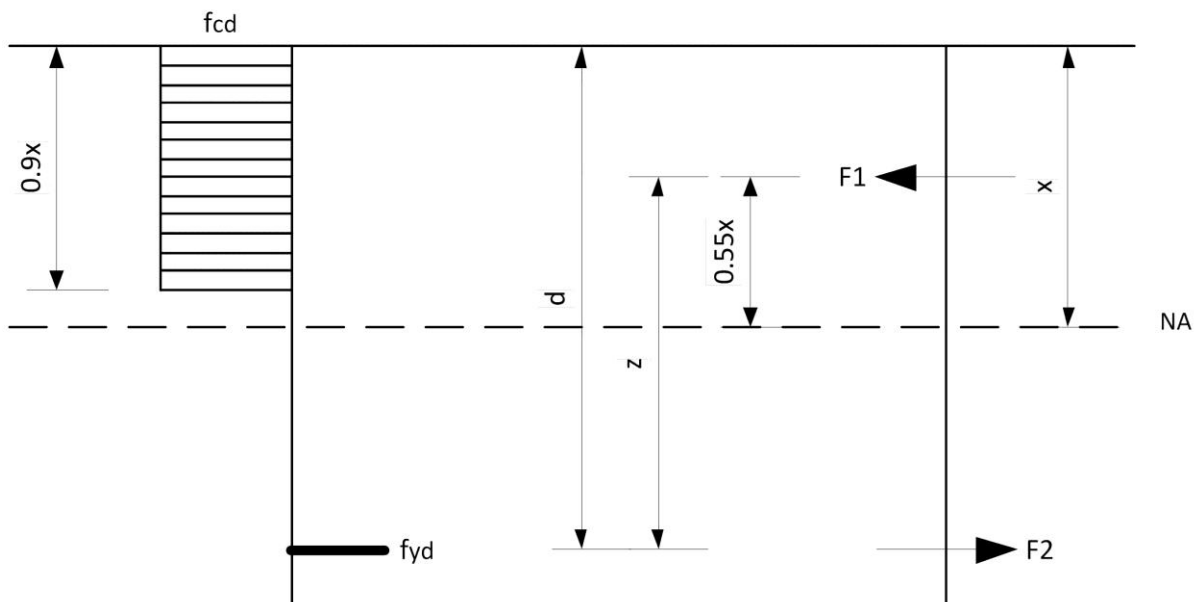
Beam section demonstrating stresses and forces being in equilibrium.
